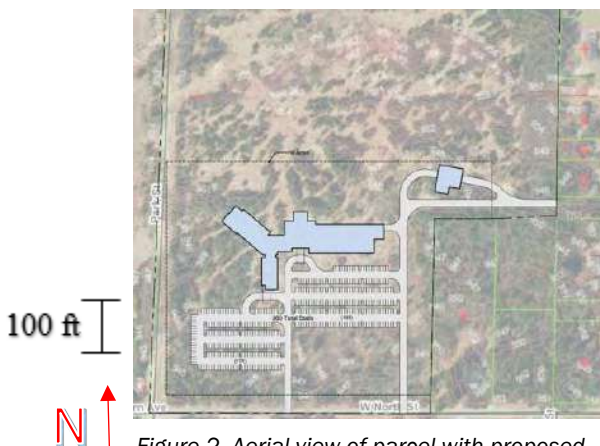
Aerial view of parcel with proposed County Facilities Building north of W North St (Potter Lawson).
